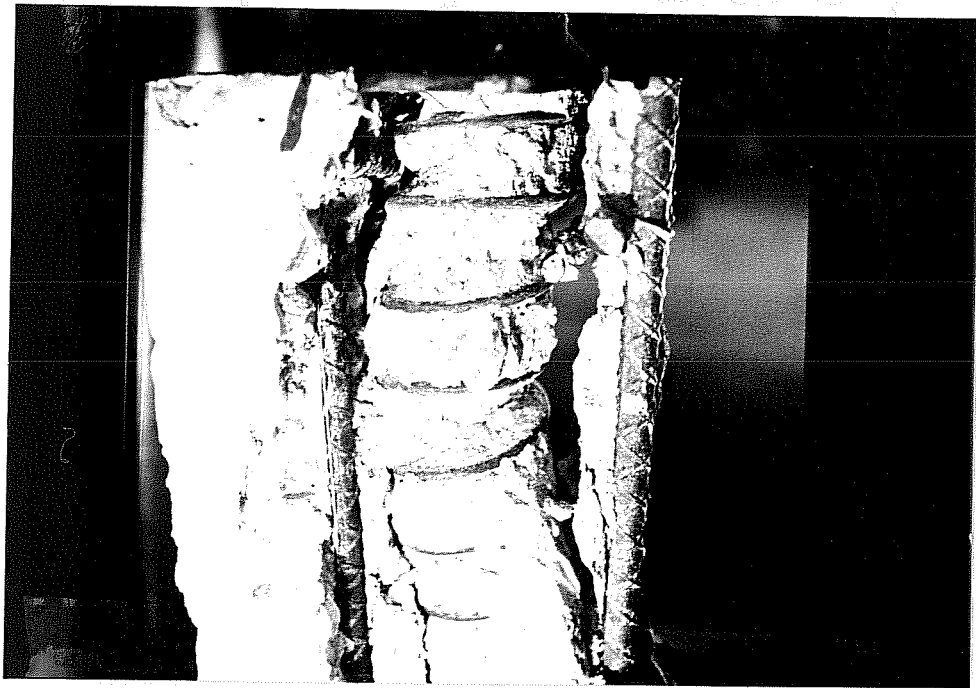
Precompression of center anchorage zone during stressing of outer anchorages
